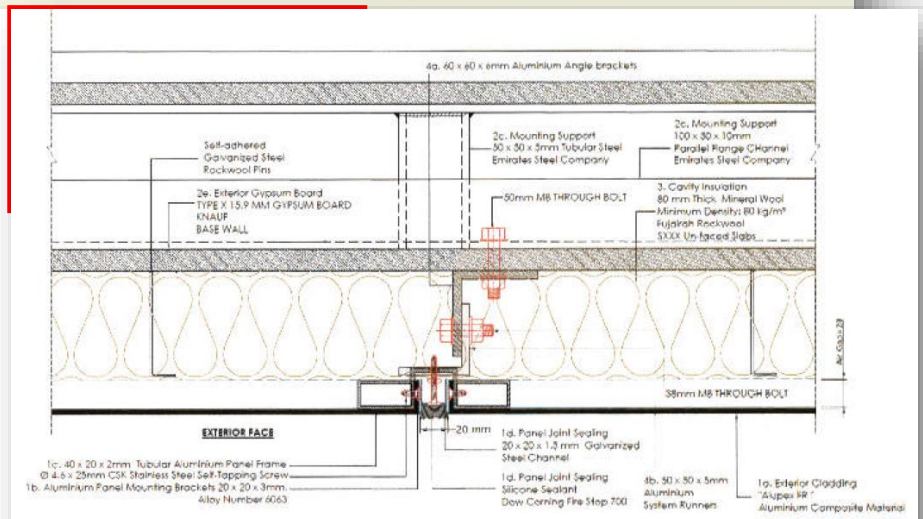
"Alupex FR" non-load-bearing exterior wall cladding Horizontal section details
